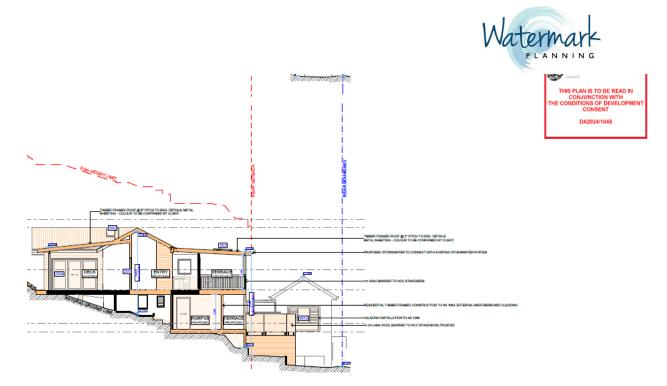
Extract from Approved Cross Sections – Cross Section (DA10)
